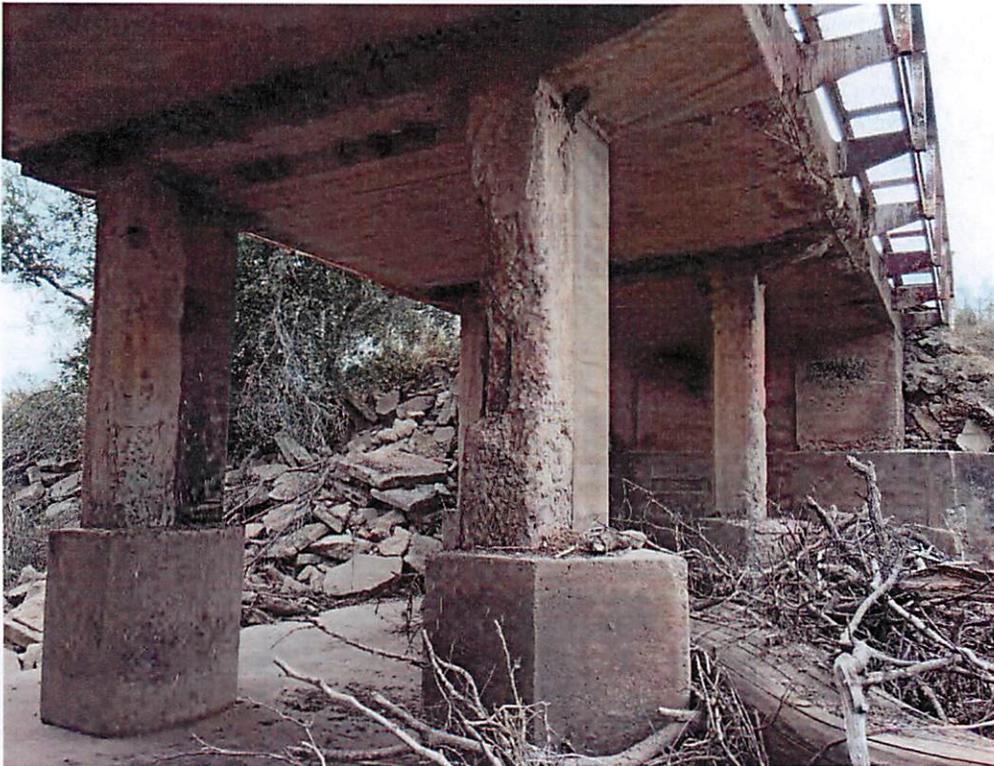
upstream edge of deteriorated deck with exposed reinforcing. Columns at the north pier with exposed / corroded reinforcing and column additions.
